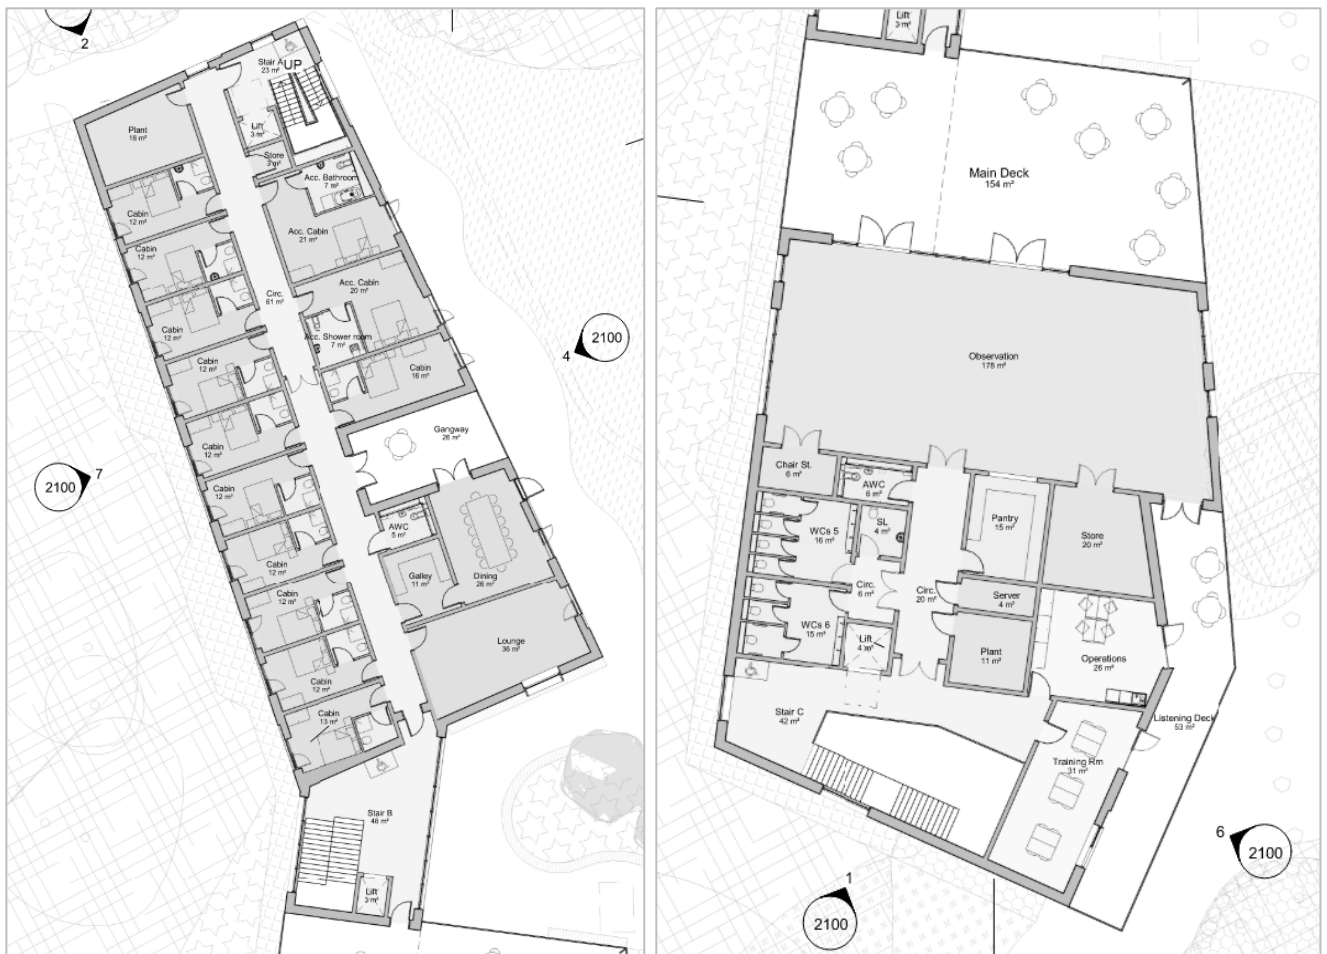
Operations Zone: First Floor North (left) and First Floor South (right)
